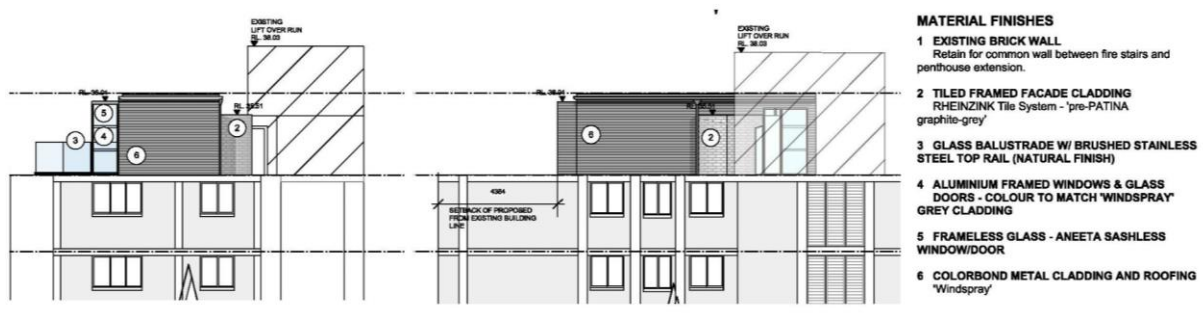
Proposed materials and finished, eastern (L) and southern (R) elevation
